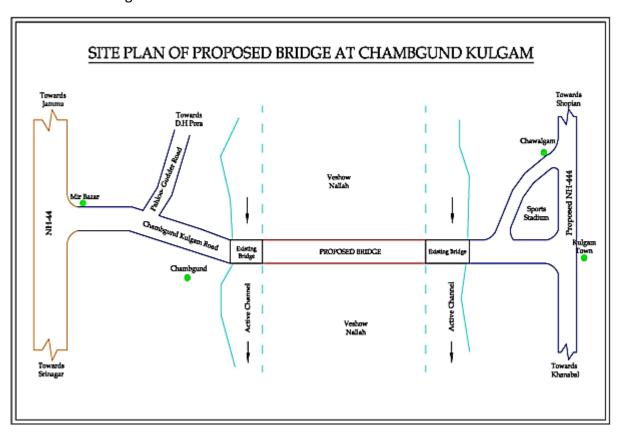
Site Plan of the proposed bridge at Chambgund, Kulgam
